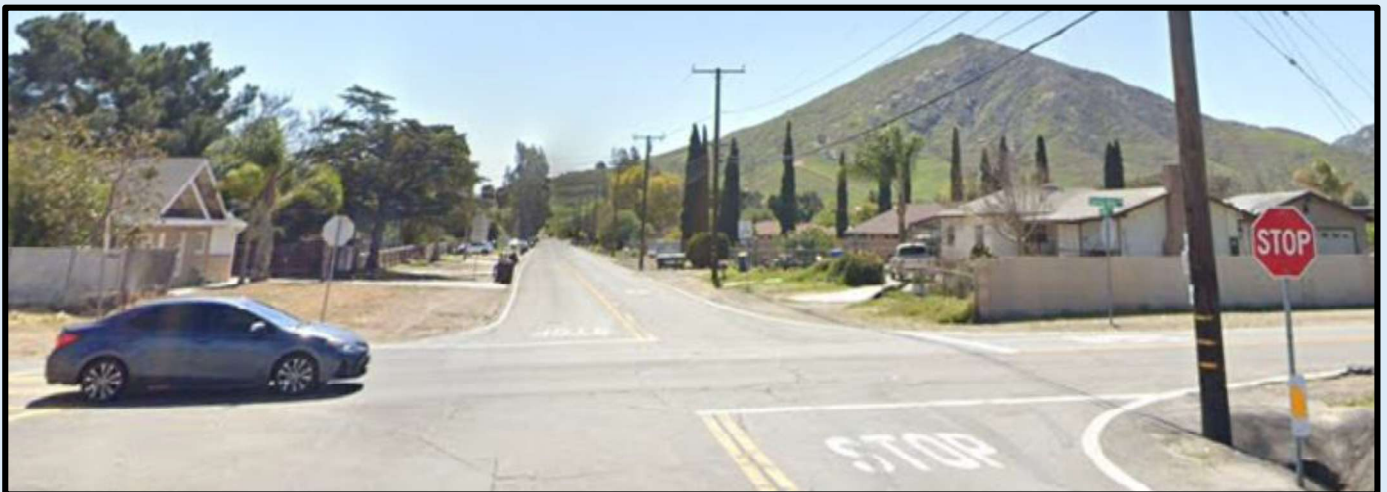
Intersection of Alder Avenue and Santa Ana Avenue facing south. Bloomington HS is located at the northwest corner of this intersection with only one north/south high-visibility crosswalk. The intersection is lacking three legs of crosswalks and has not east/west cross walks. The project will install the three missing crosswalks at this intersection to increase safety of students travelling to and from school from the adjacent southern and eastern neighborhoods.
